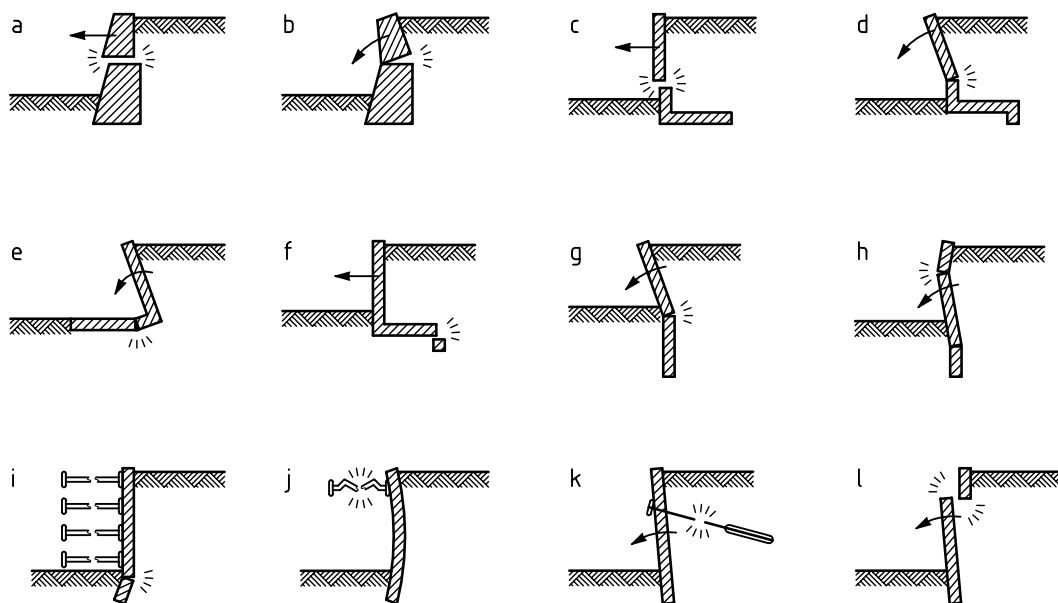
Examples of limit modes for structural failure of retaining structures.
